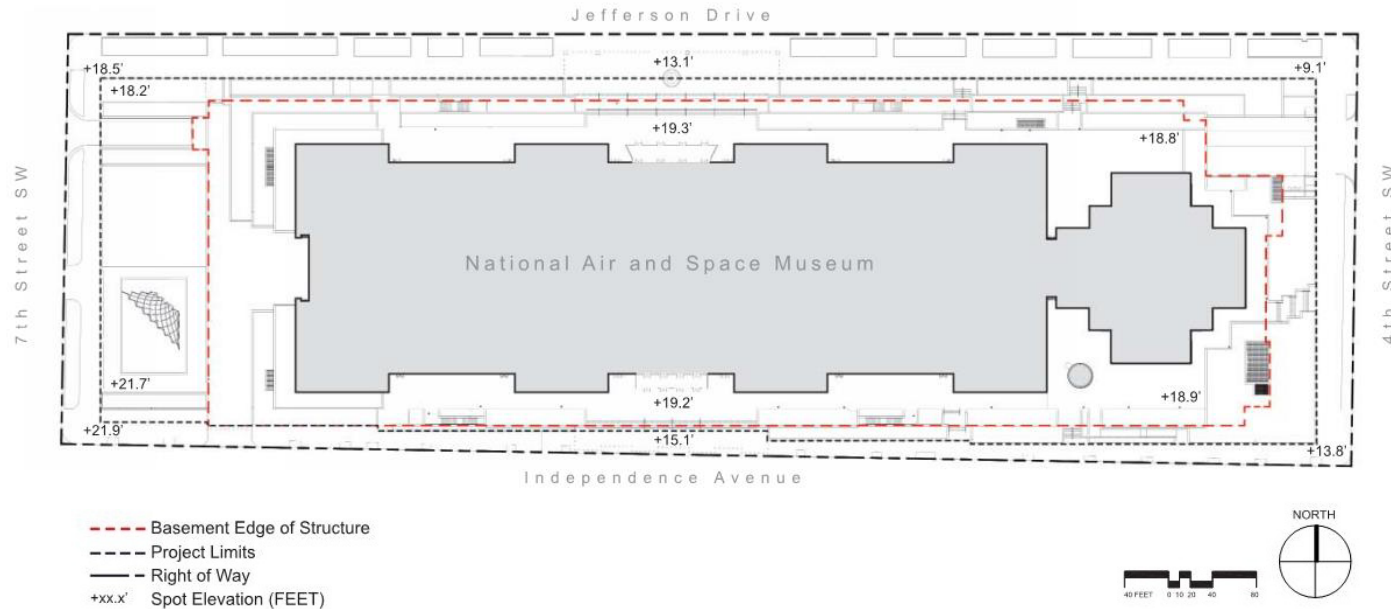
25: Existing Site Elevations. (Source: AECOM.)
